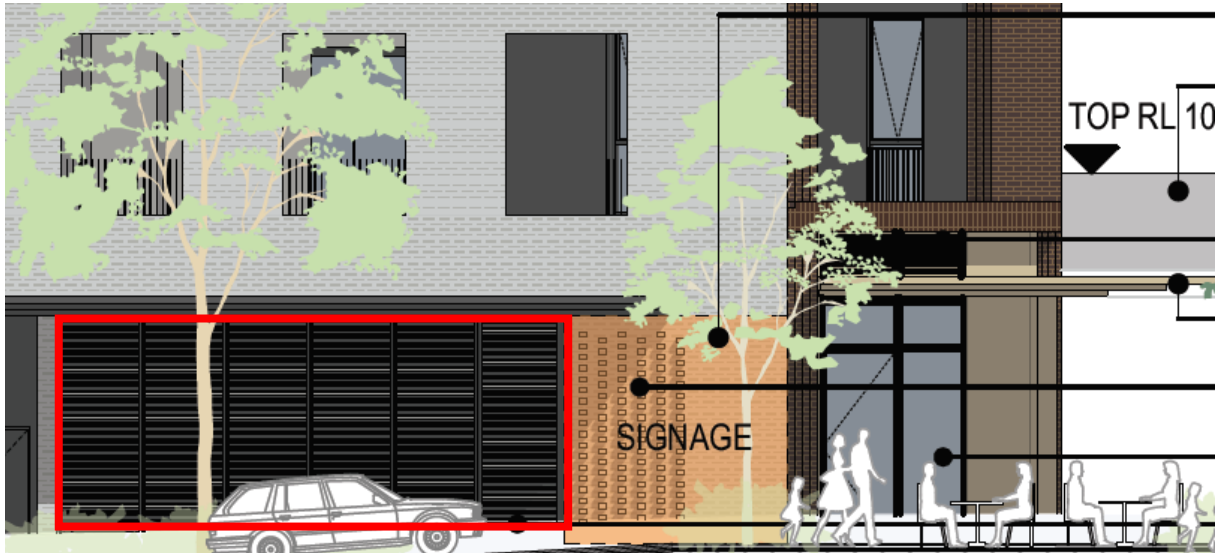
East elevation extract - substation outlined in red (Source: Turner)
